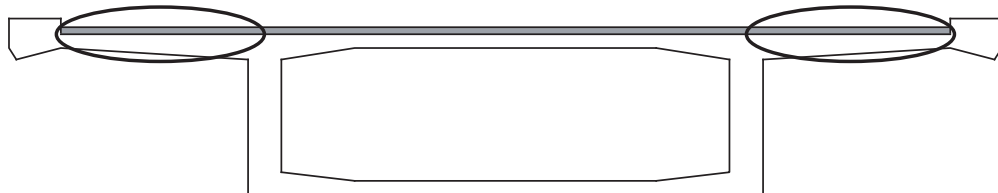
RC bridge deck slab improved with R-UHPFRC layer
